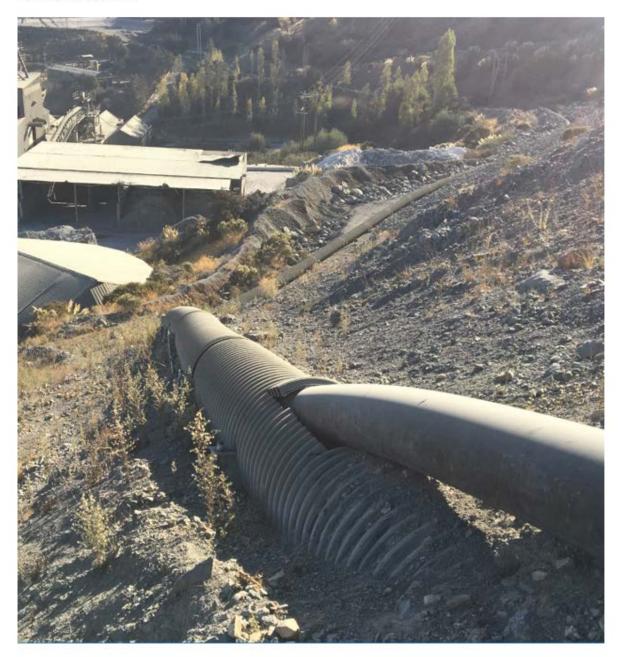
Exposed new 12" pipeline in EMSA by D10 ditch to allow Stormwater drainage
